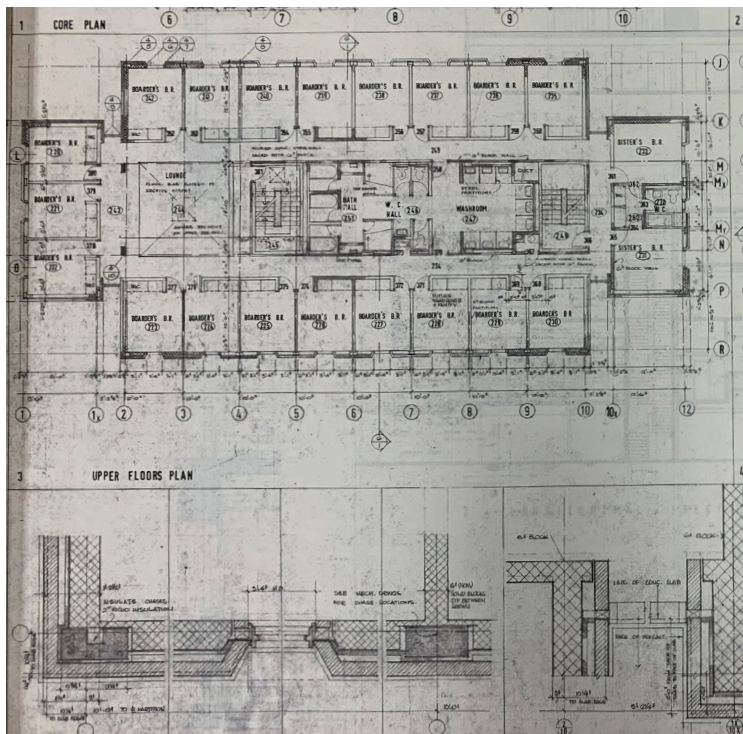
Floor plan and details, Building E (T. V. Murray, c. 1964).
